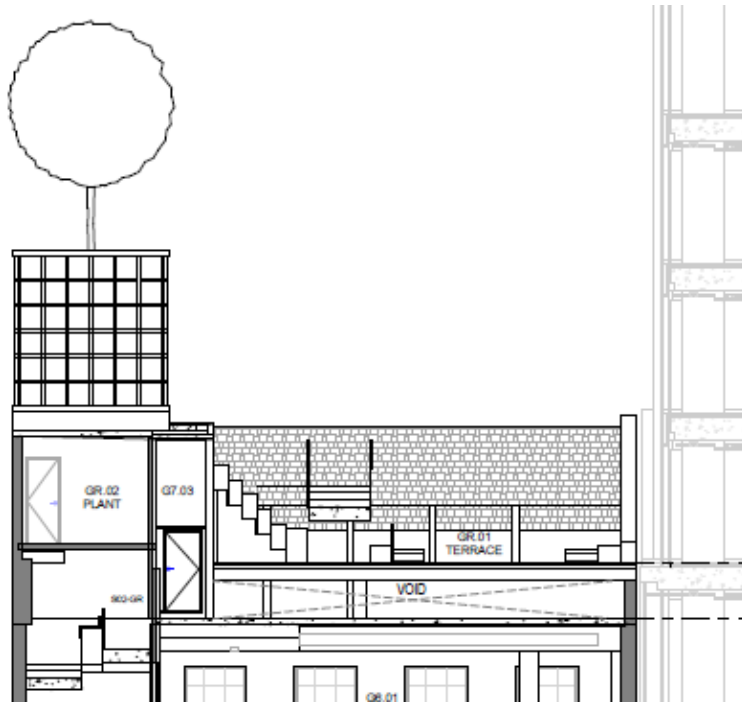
Proposed new roof section, north-south section showing connection to the new office building floor level adjacent, the proposed new stepped planter bed, the new plant to the water tower and the new viewing platform. (Source: Make, drawing number -285-51-02-1, December 2018)
